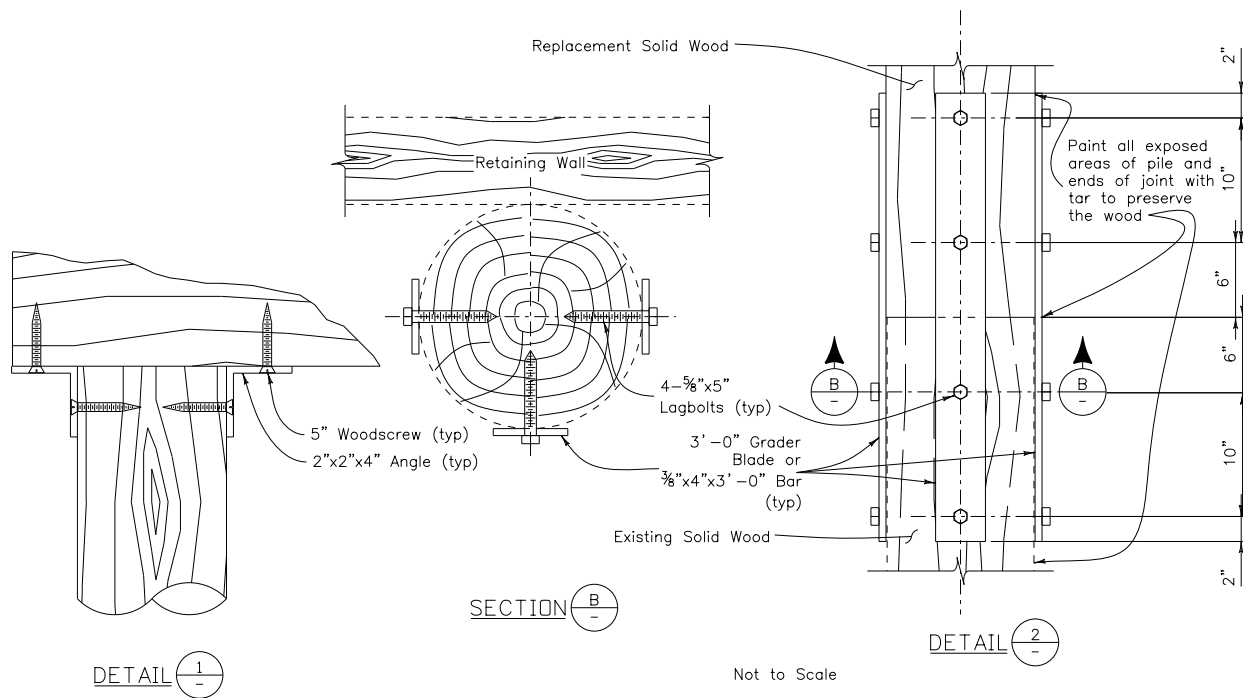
(G)-8 Sample Details of Replacing Portion of Timber Pile
